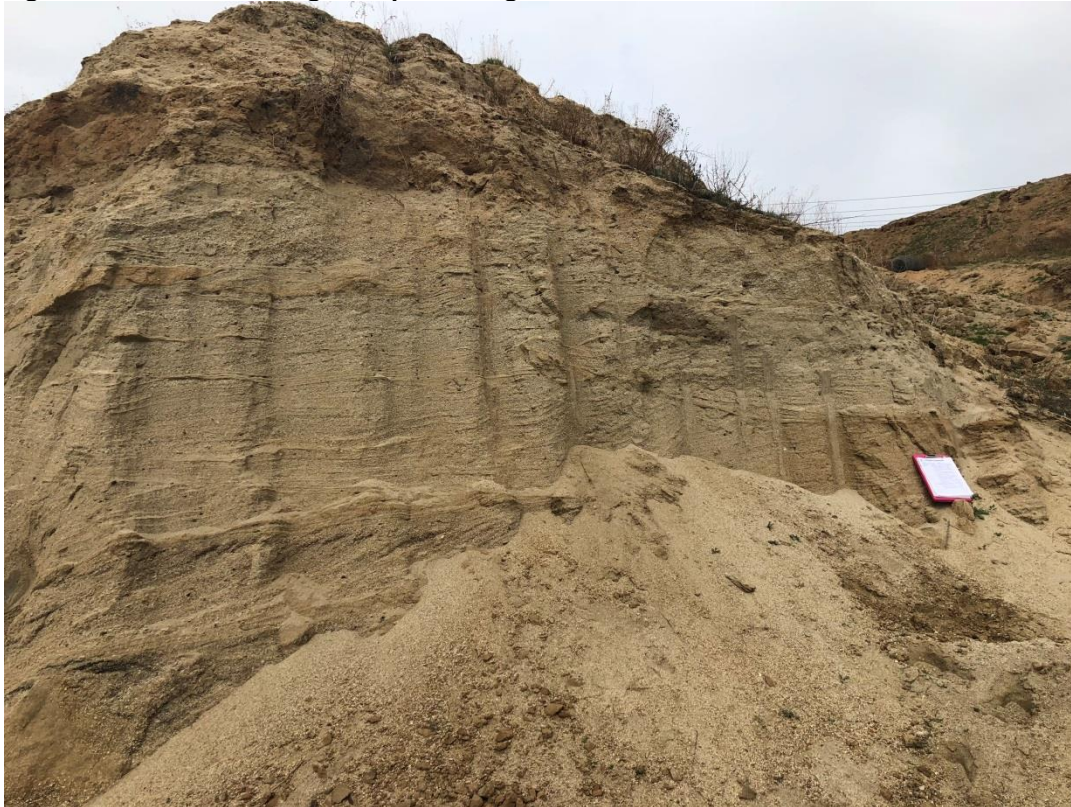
View of cut edge of pit and building debris pile, facing southeast
